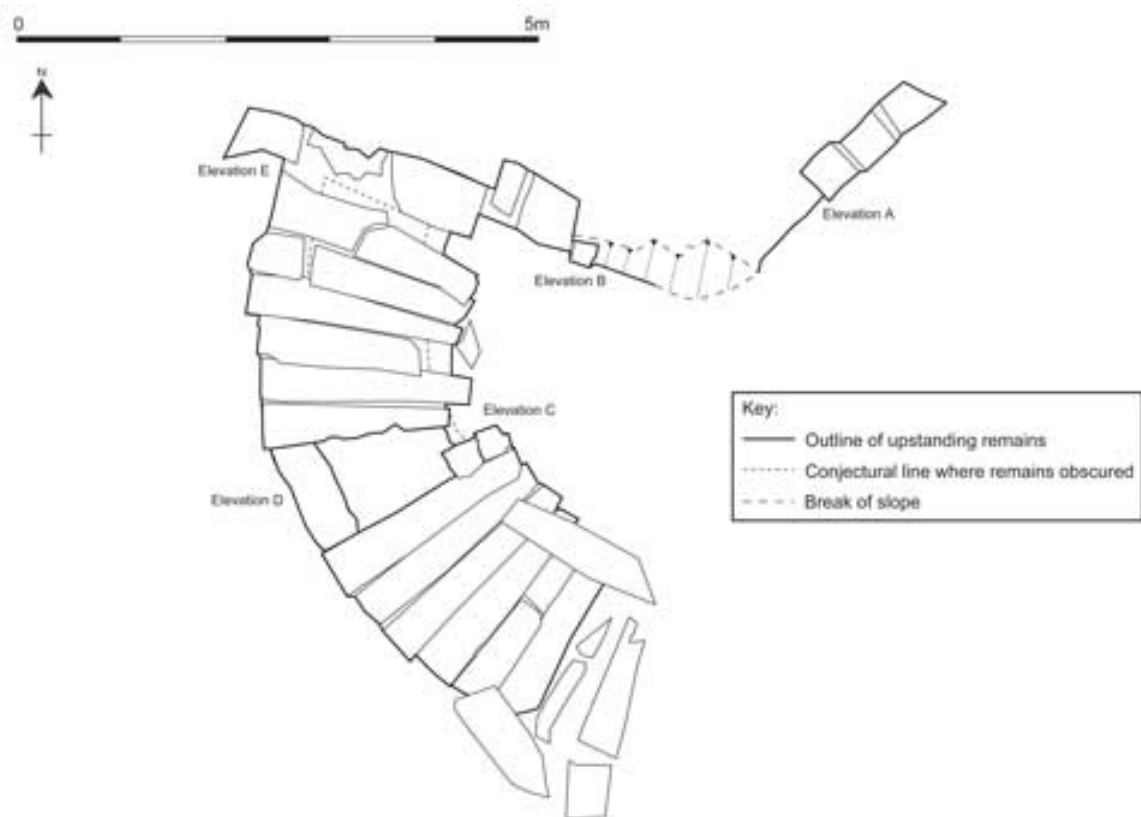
Structure 1 – West Stair, Flower Garden: Plan
